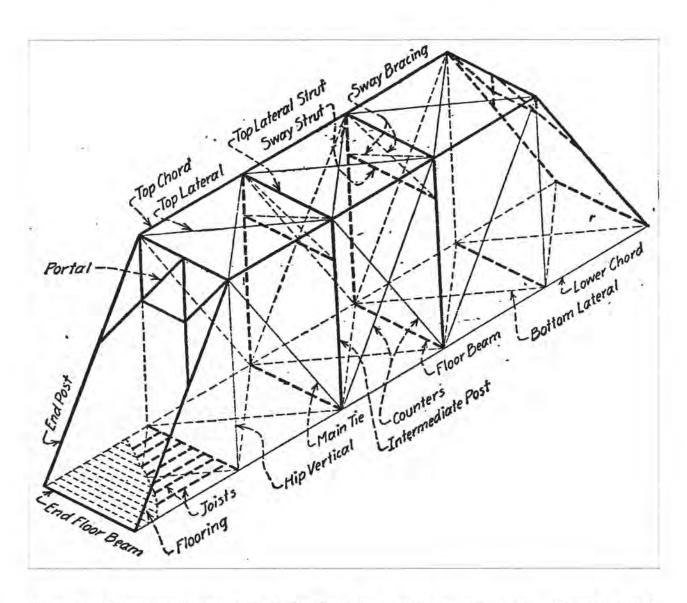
Diagrammatic sketch of an overhead Pratt truss highway bridge. (Source: Milo S. Ketchum, The Design of Highway Bridges [New York, 1908], p. 2).
